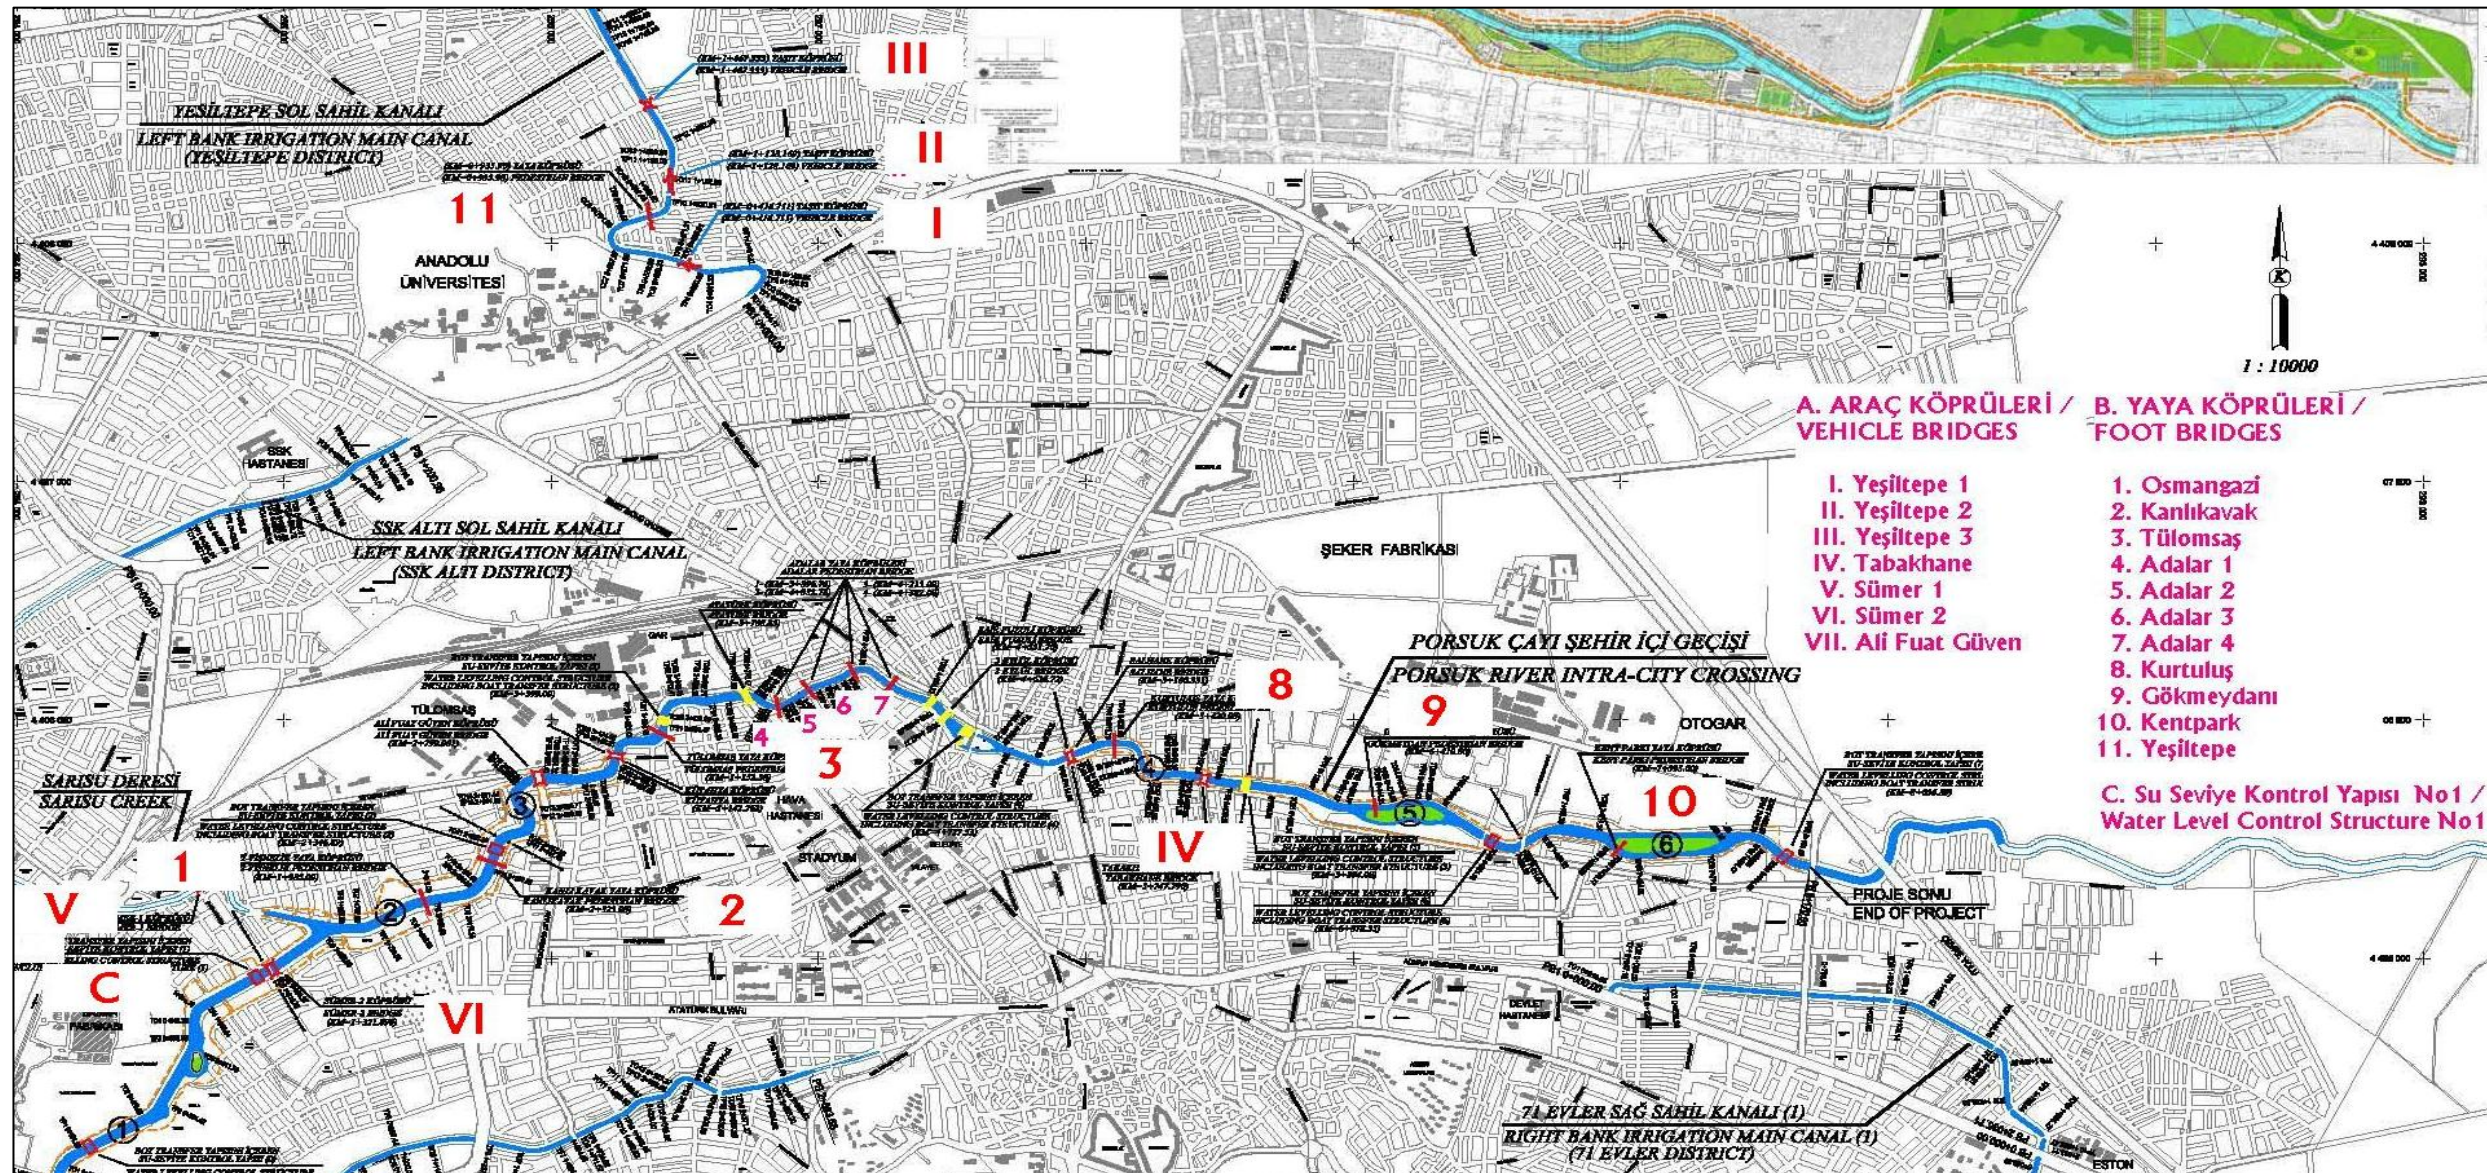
Layout Plan that Shows Vehicle Bridges, Pedestrian Bridges, and Water Level Control Structures
